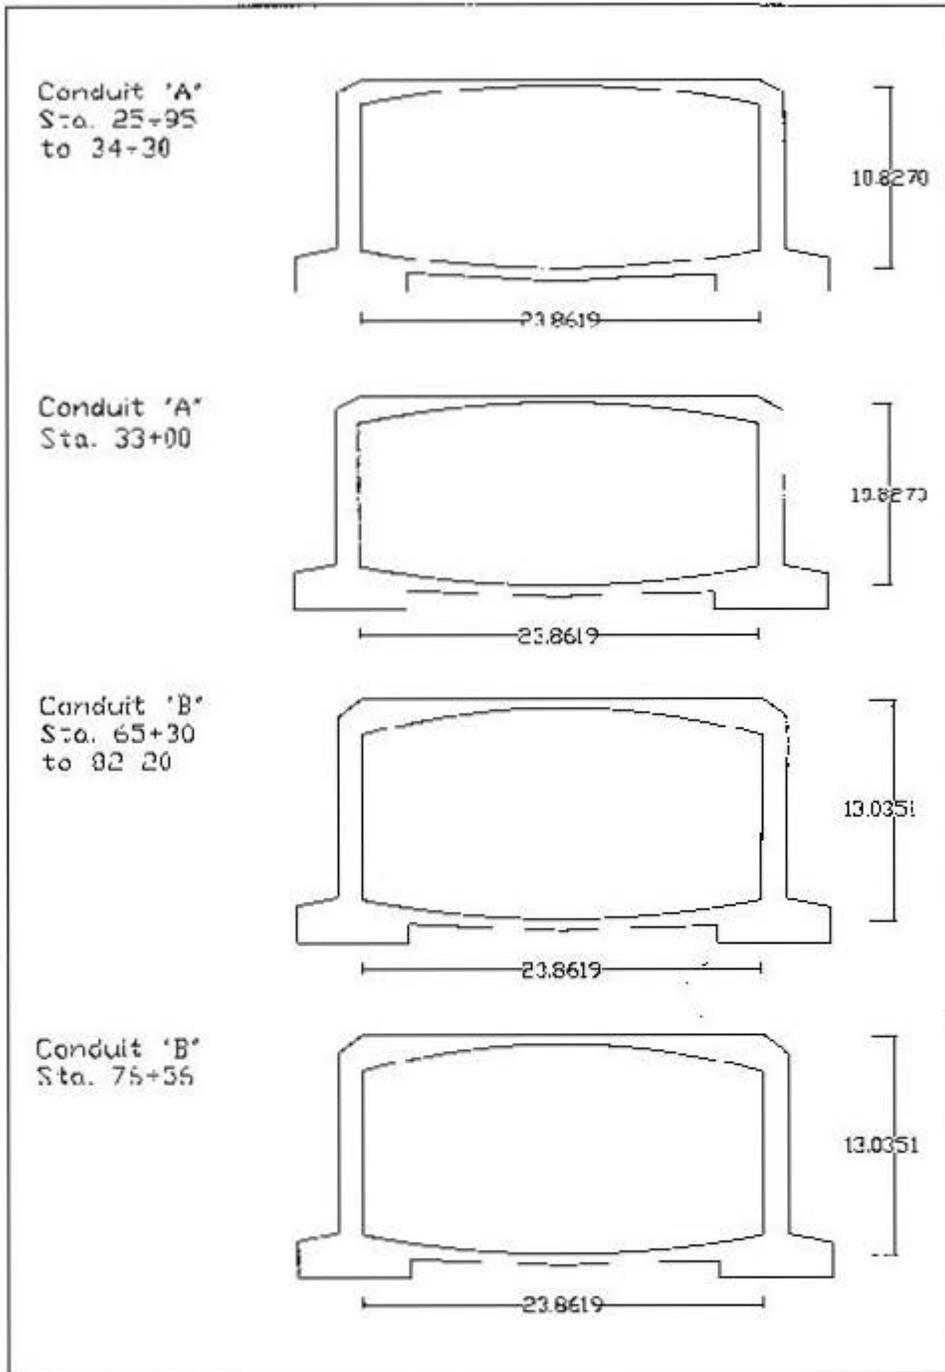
Representative Cross-sections of Closed Conduit Portions of the American Canal (Redrawn from original engineering drawings on file at IBWC).
